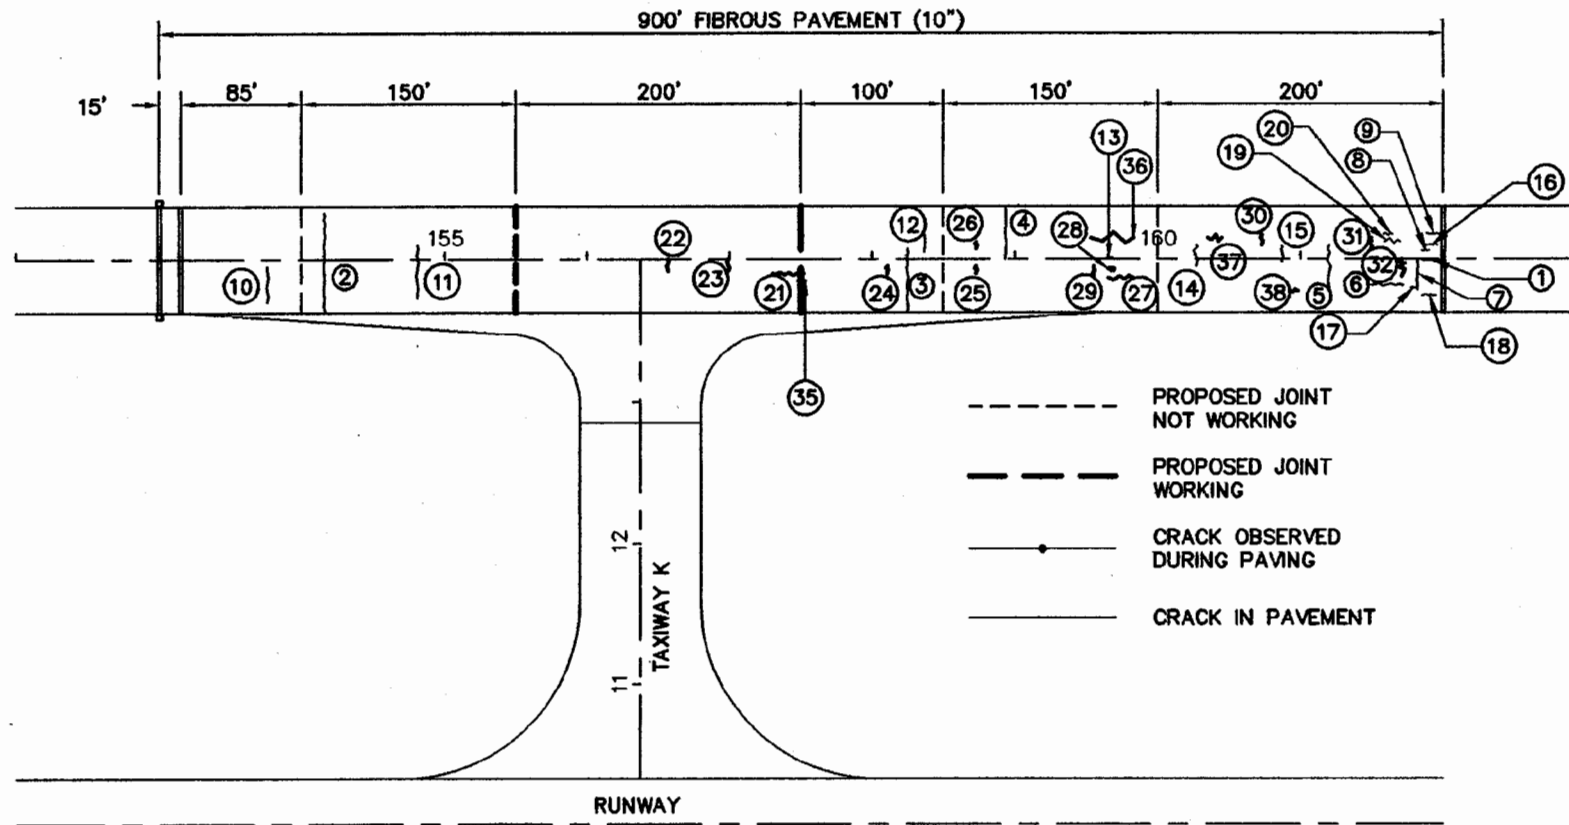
CRACKS IN FIBROUS PCC PAVEMENT, WINTER 1998
